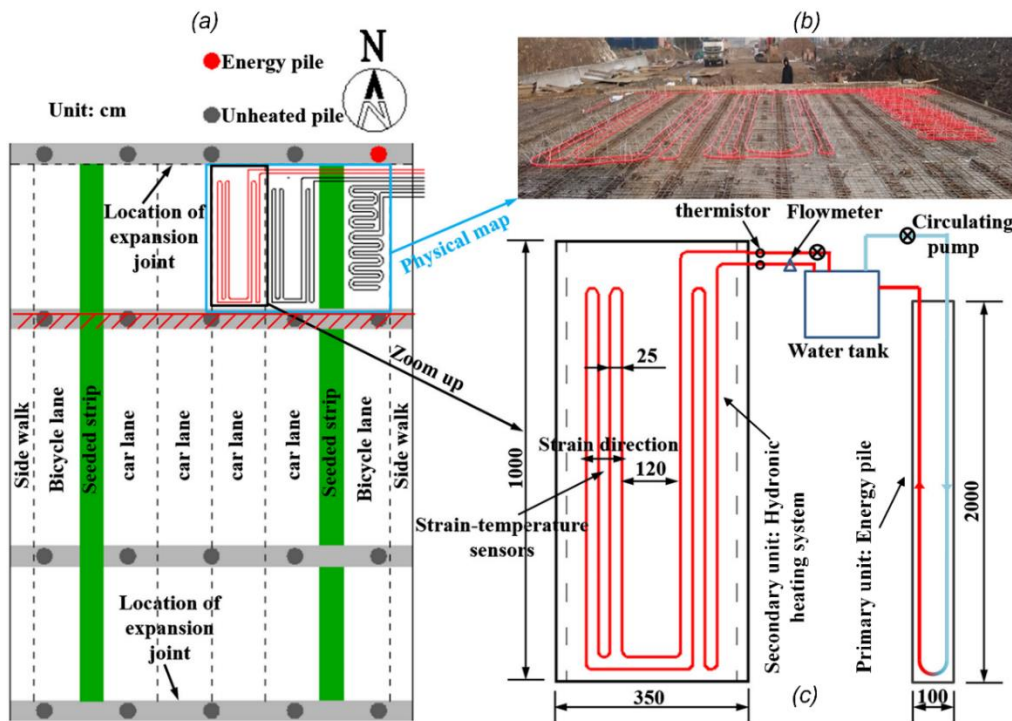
(a) Location of the studied section of the bridge (b) photo of bridge deck before pouring concrete (c) layout of bridge deck deicing (Kong et al., 2019)
